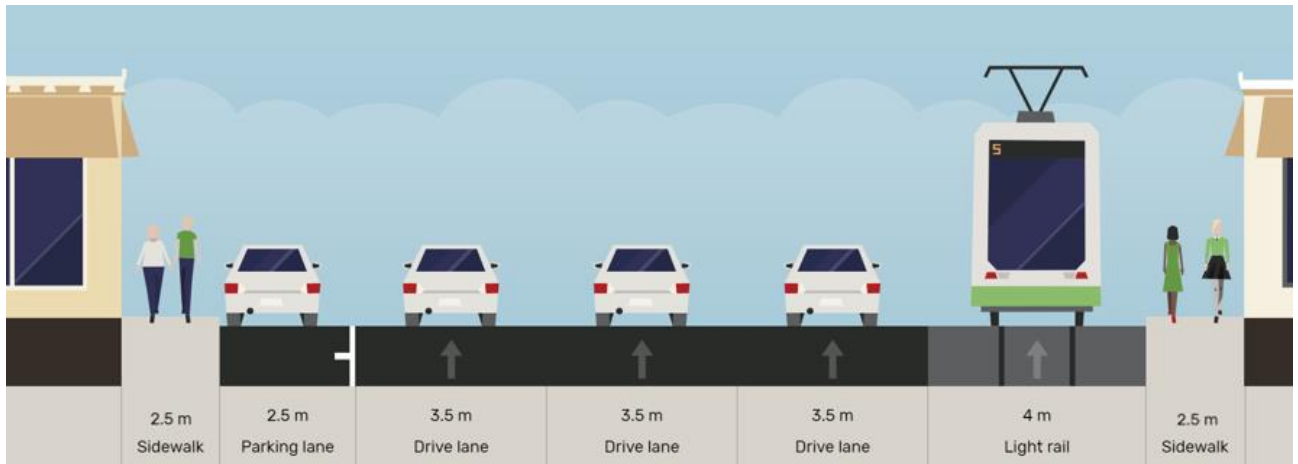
Indicative cross section light rail (on-road, single direction)
